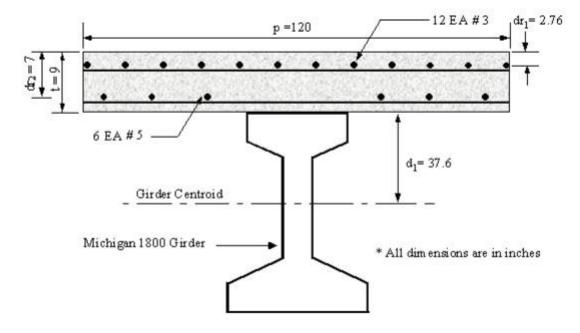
Geometry and reinforcement arrangement of the deck section supported on PCI girders
